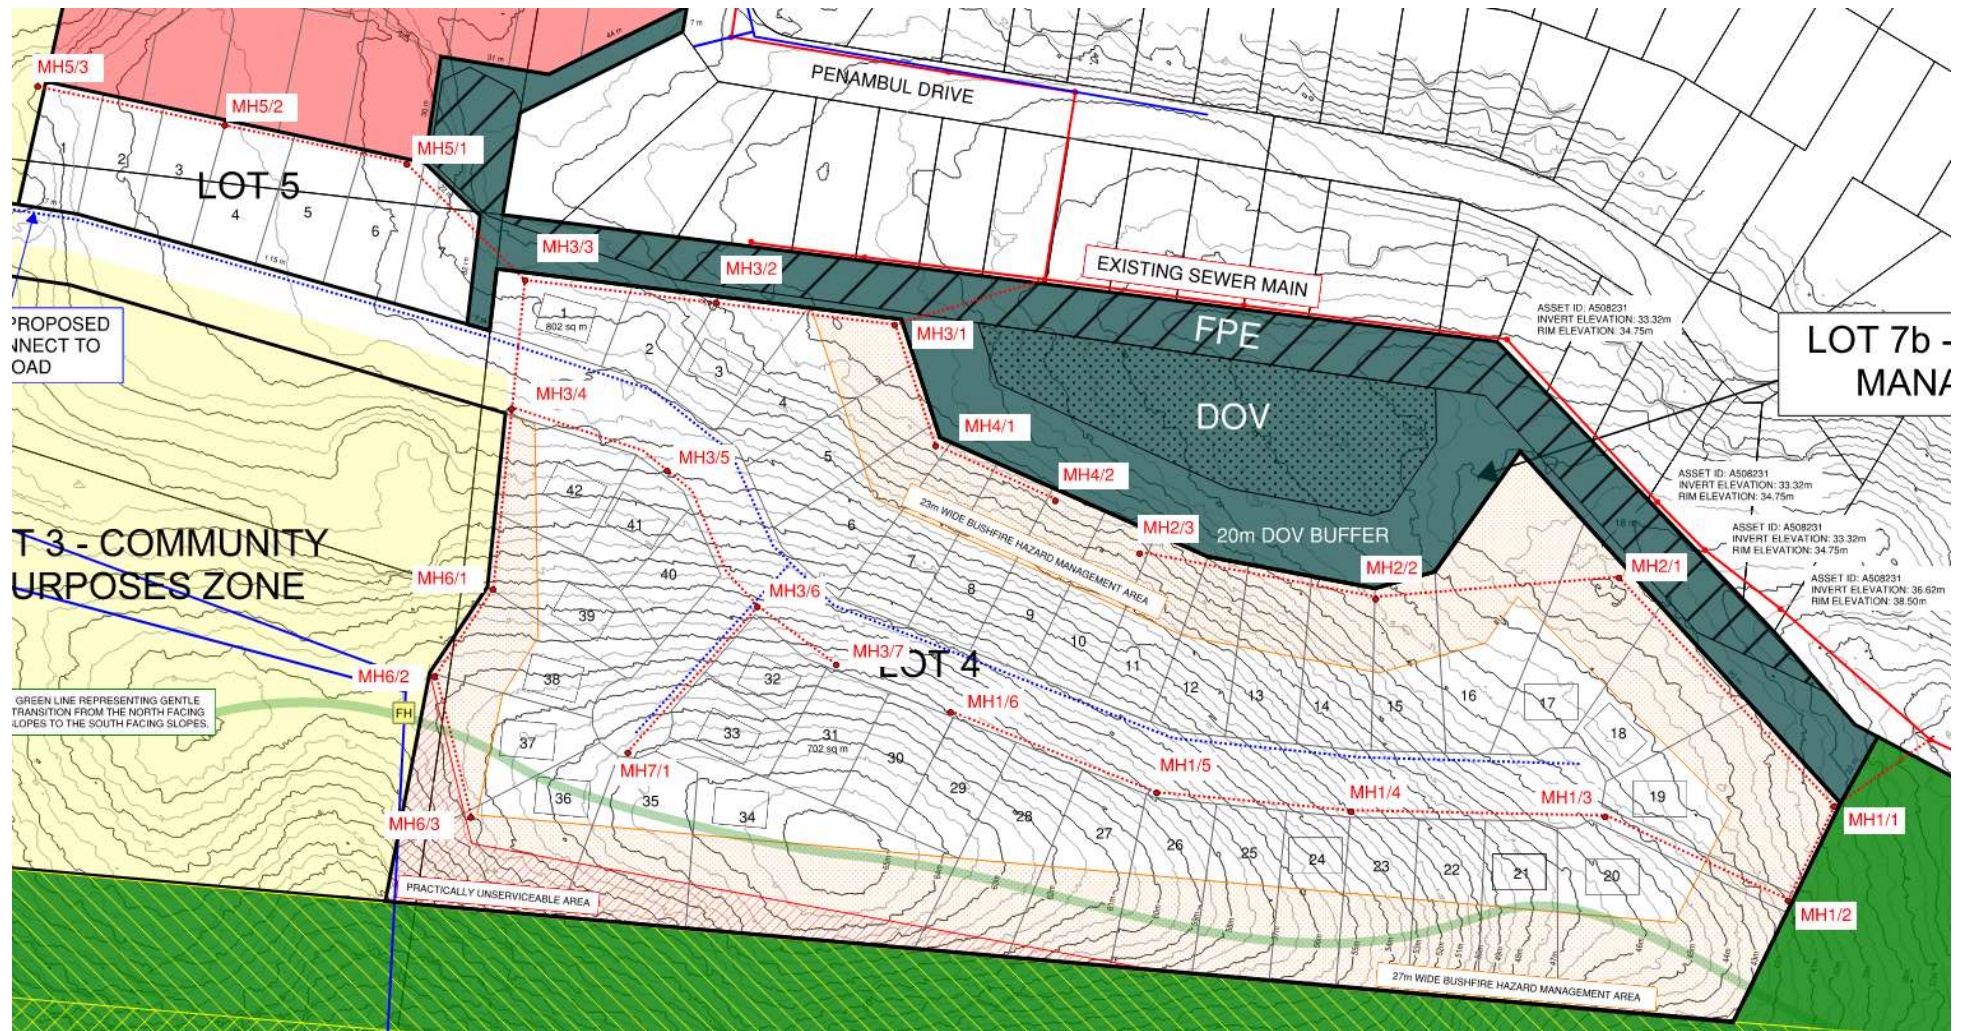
Concept servicing plan for lot 4 and lot 5 of 133 Middle Road
